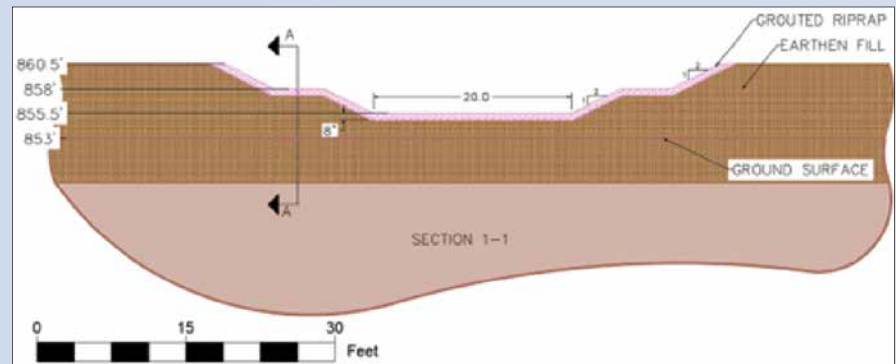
Proposed grouted riprap liner embankment layout for Koshkonong Creek Project.
